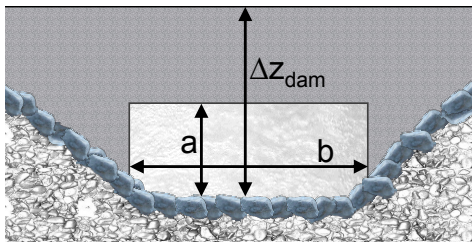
Relevant geometric parameters of a partially open barrier (open check dam) for primarily hydraulic control; indicating the opening height a , opening width b and the barrier height Δz_{dam} .
